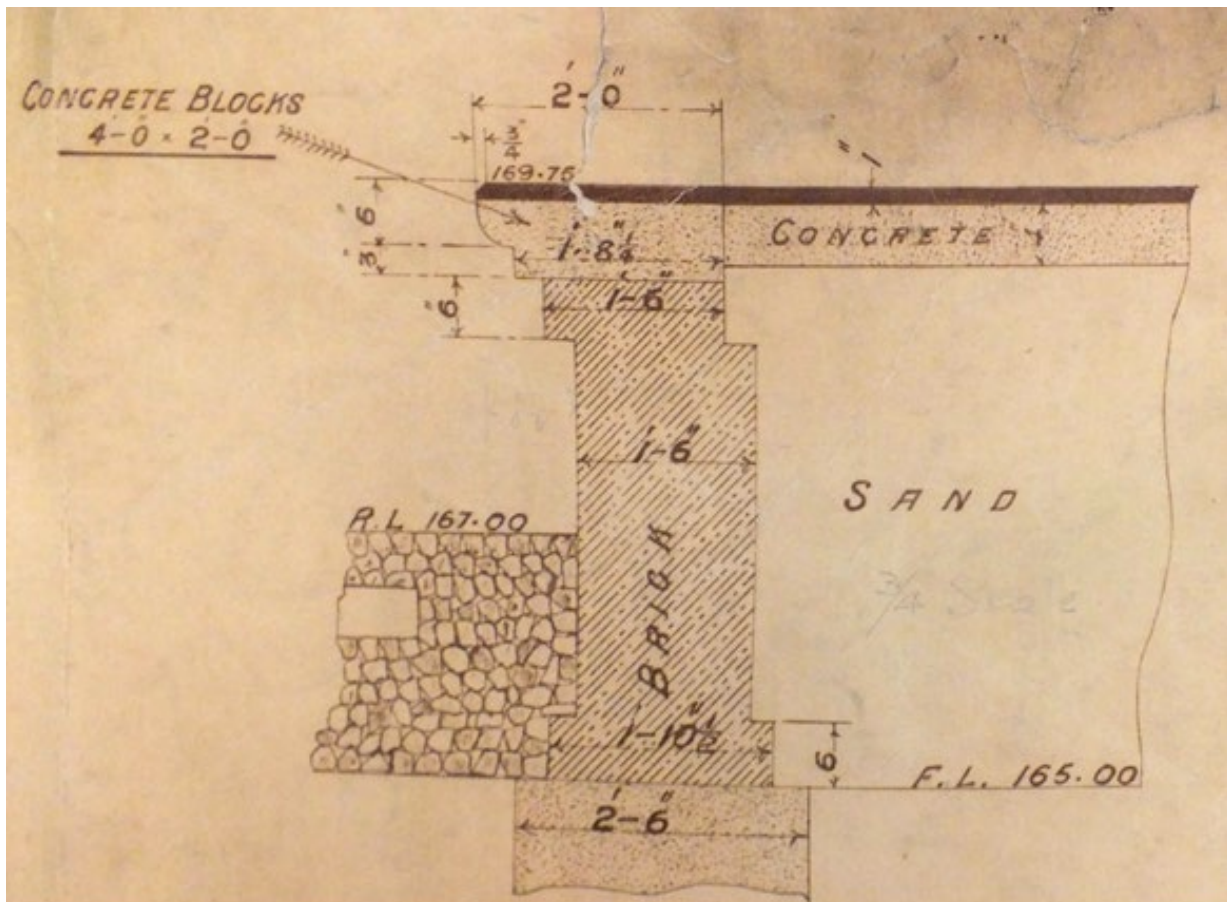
Standard platform design for Central Railway Station construction, 1902.
